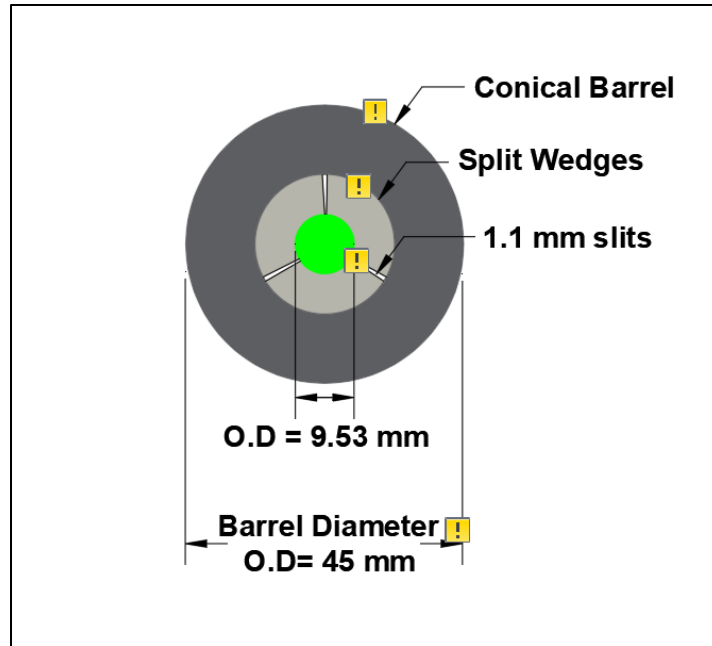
Split Wedge and Barrel Anchor Cross Section
